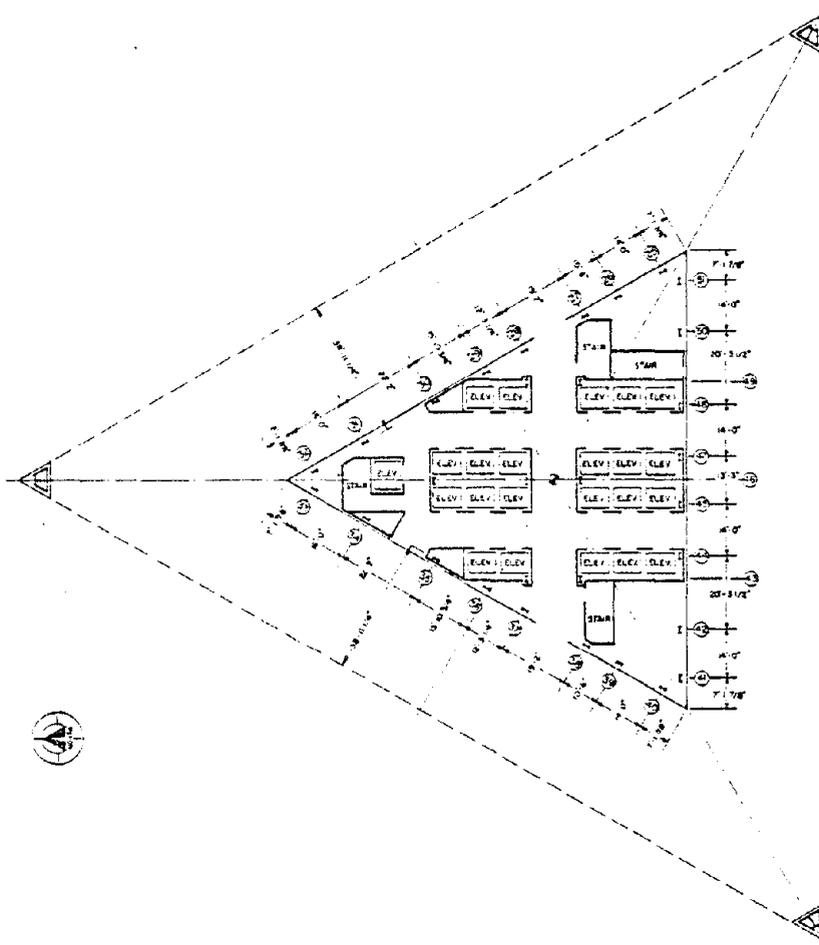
FLOOR PLAN ON PLAZA LEVEL
